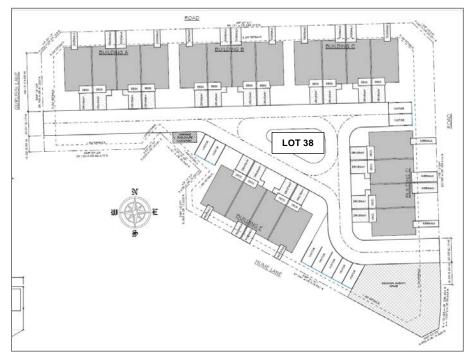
Proposed Lot 38 Site Plan showing five four-unit townhouses
